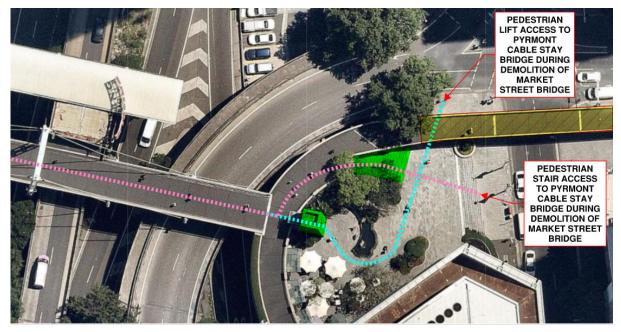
Access to Pyrmont Bridge via existing stairs and lift during demolition of Market Street Bridge
